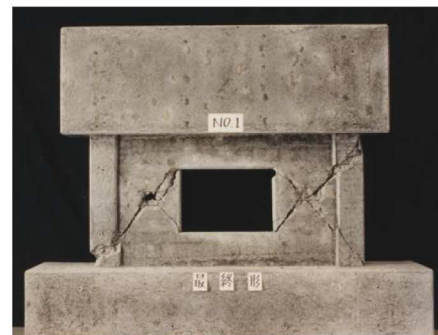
Test specimen of reinforced concrete wall with an opening failing in shear [11]
